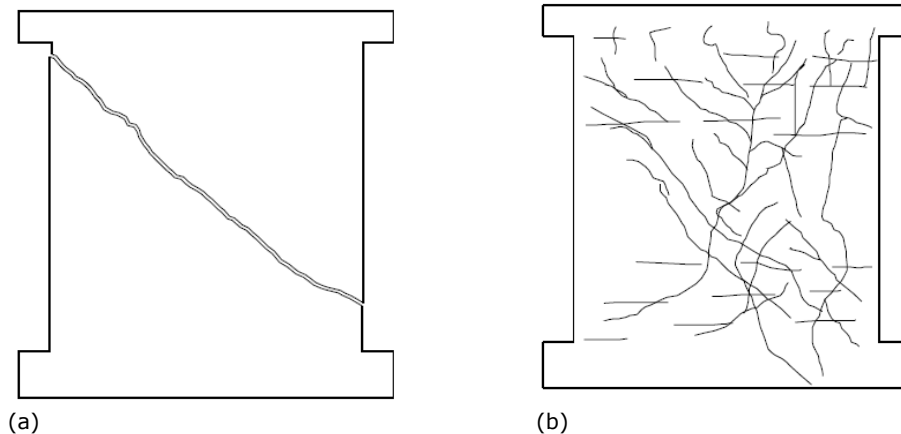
(a) Brittle-shear failure and (b) ductile shear failure of wall panel [220]
